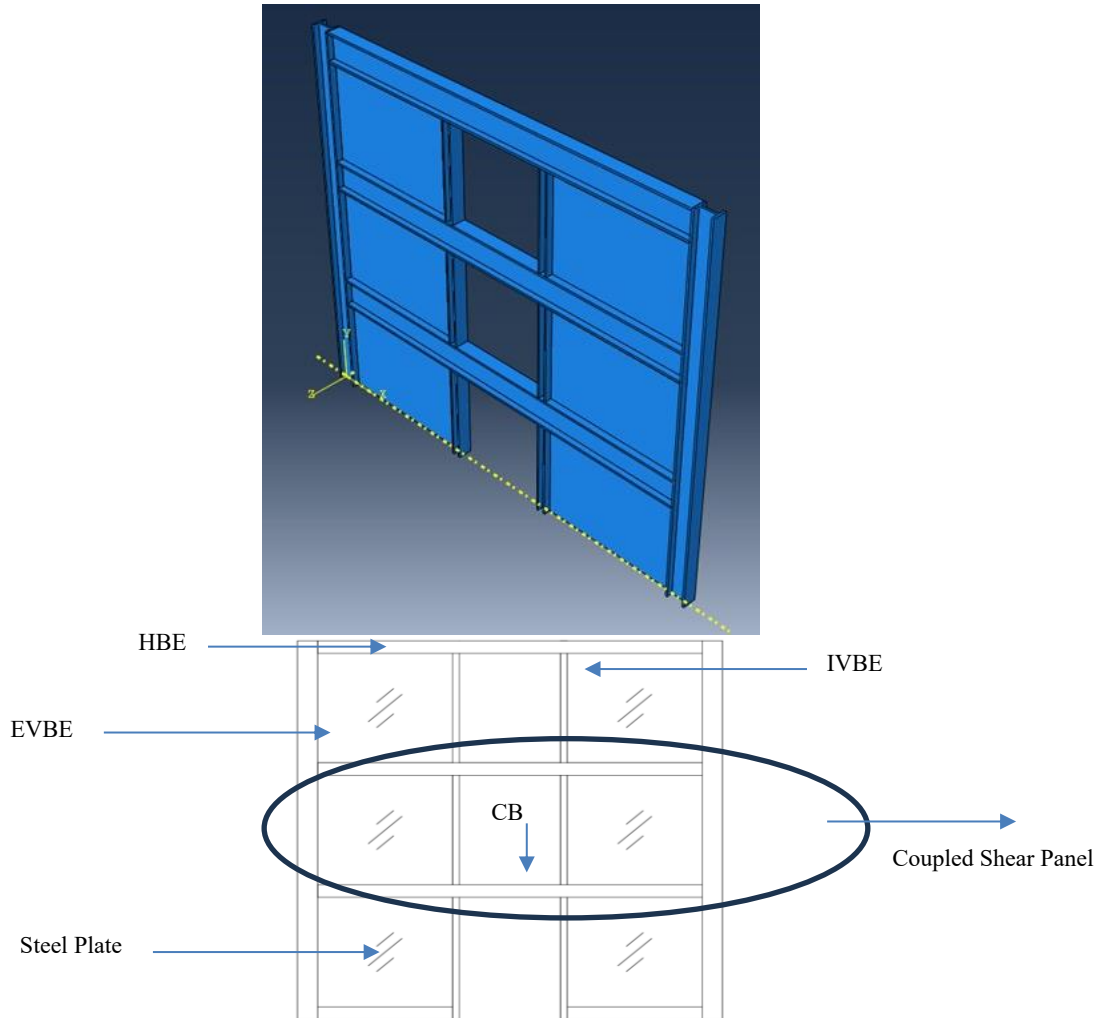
3D (up) and 2D (down) Schematic Views of a Coupled Steel Plate Shear Wall (C-SPSW) and Coupled Shear Panel
